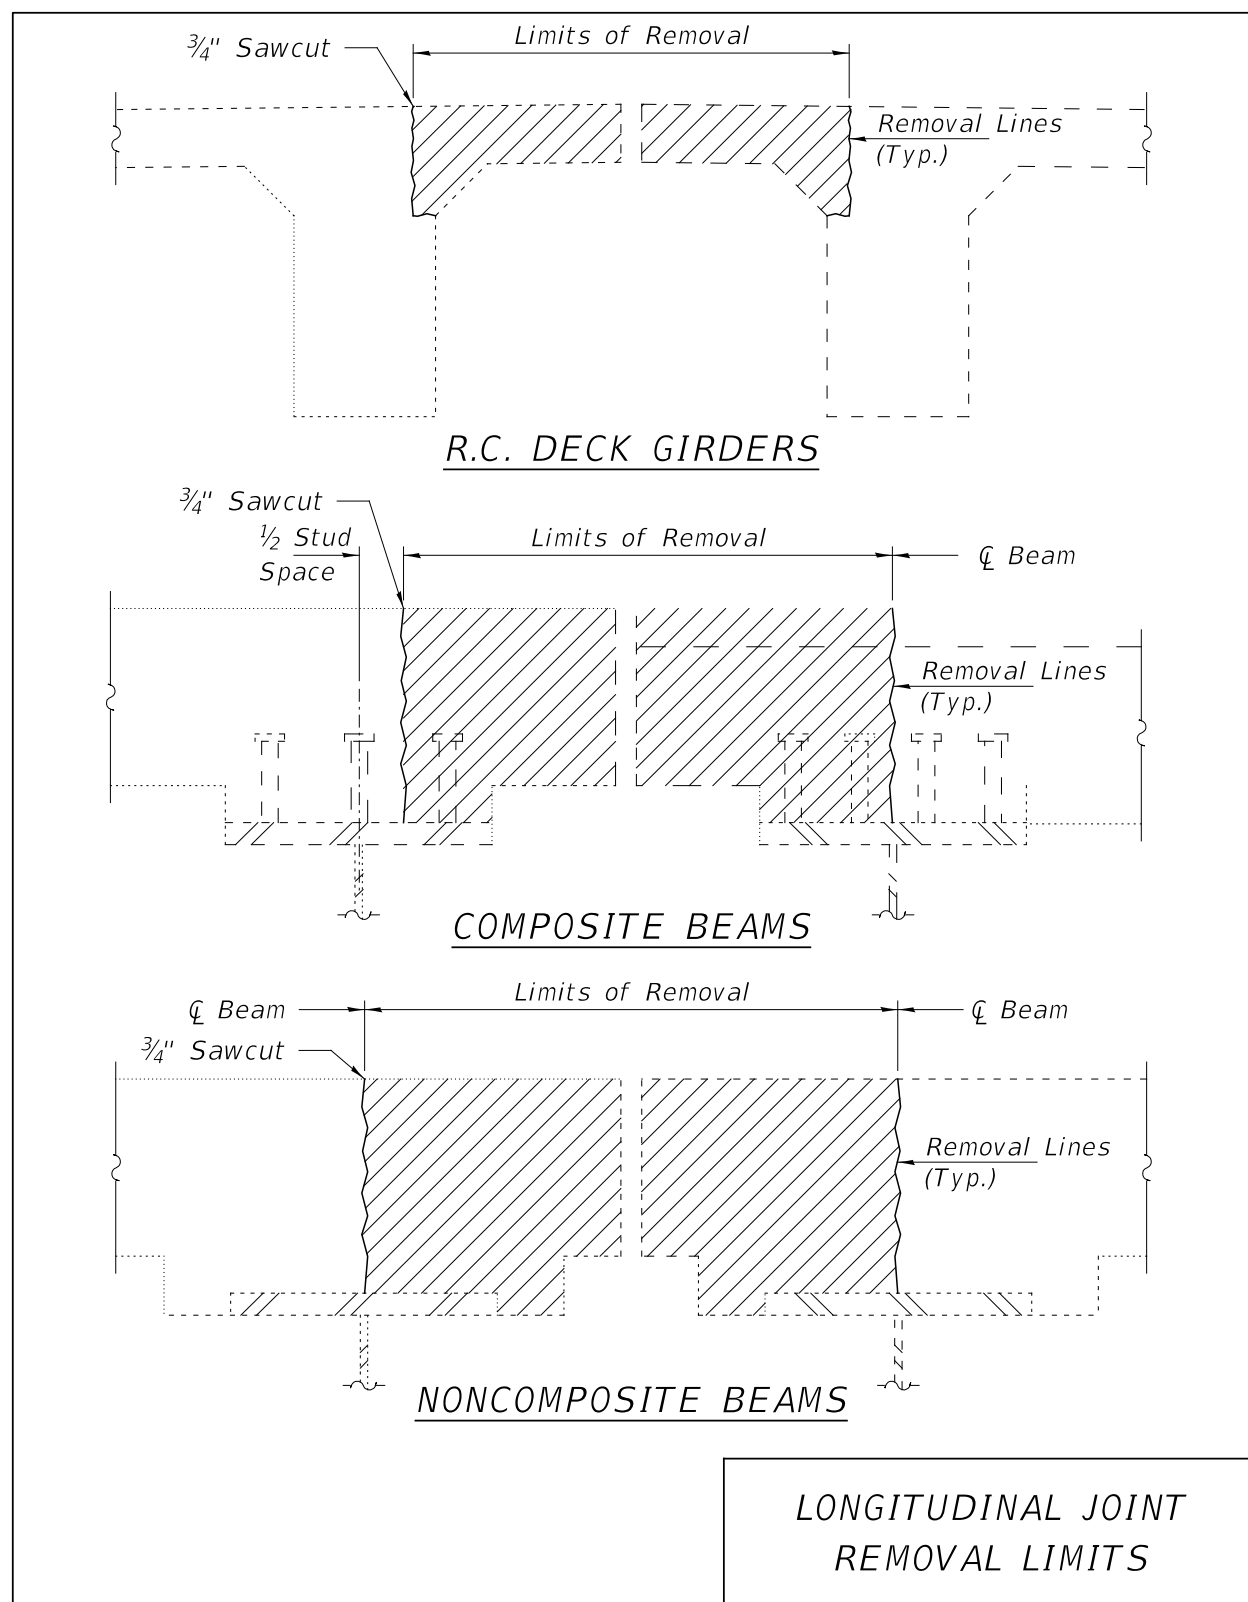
Longitudinal Joint Removal Limits
